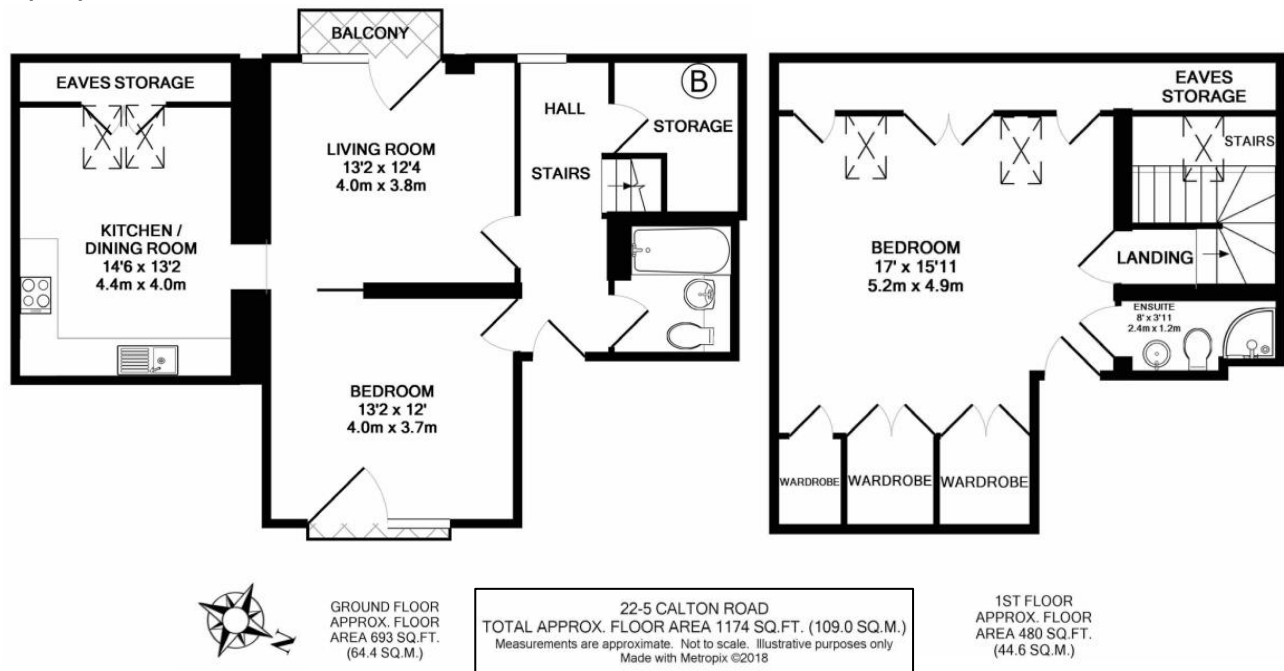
Existing Floor Plans of the flat no.22/5 Calton Rd
